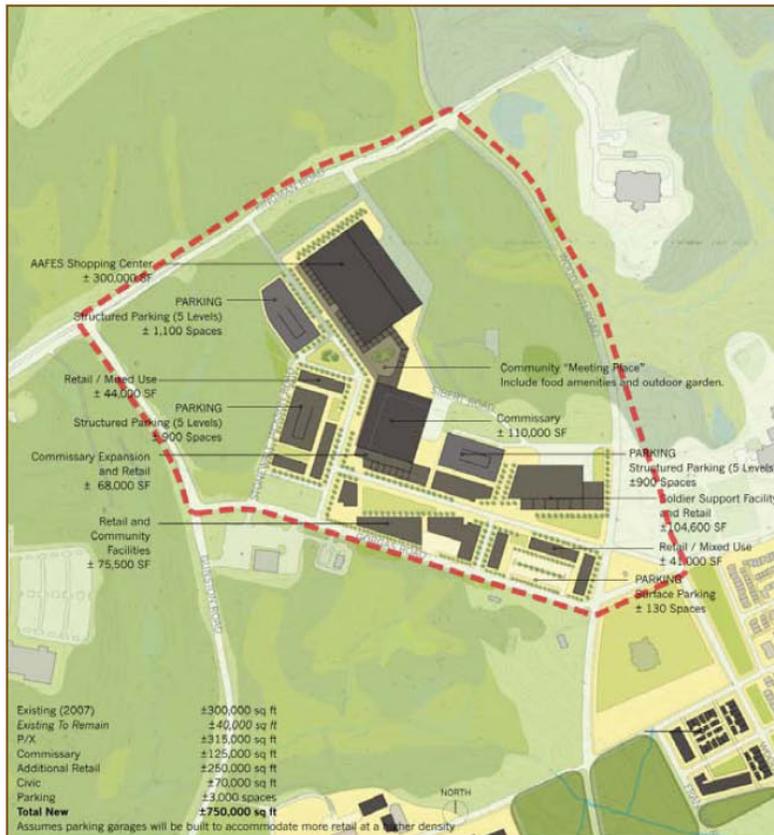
Proposed Development Plan for the Airfield Area as Presented in ADP
